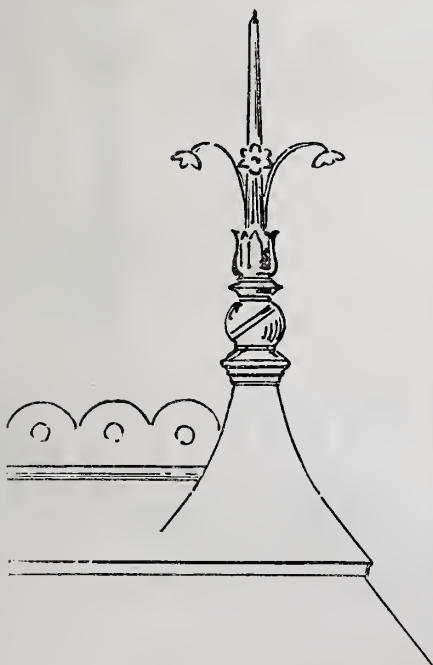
Finial and Cresting.—Scale, 3/4 Inch to the Foot.
